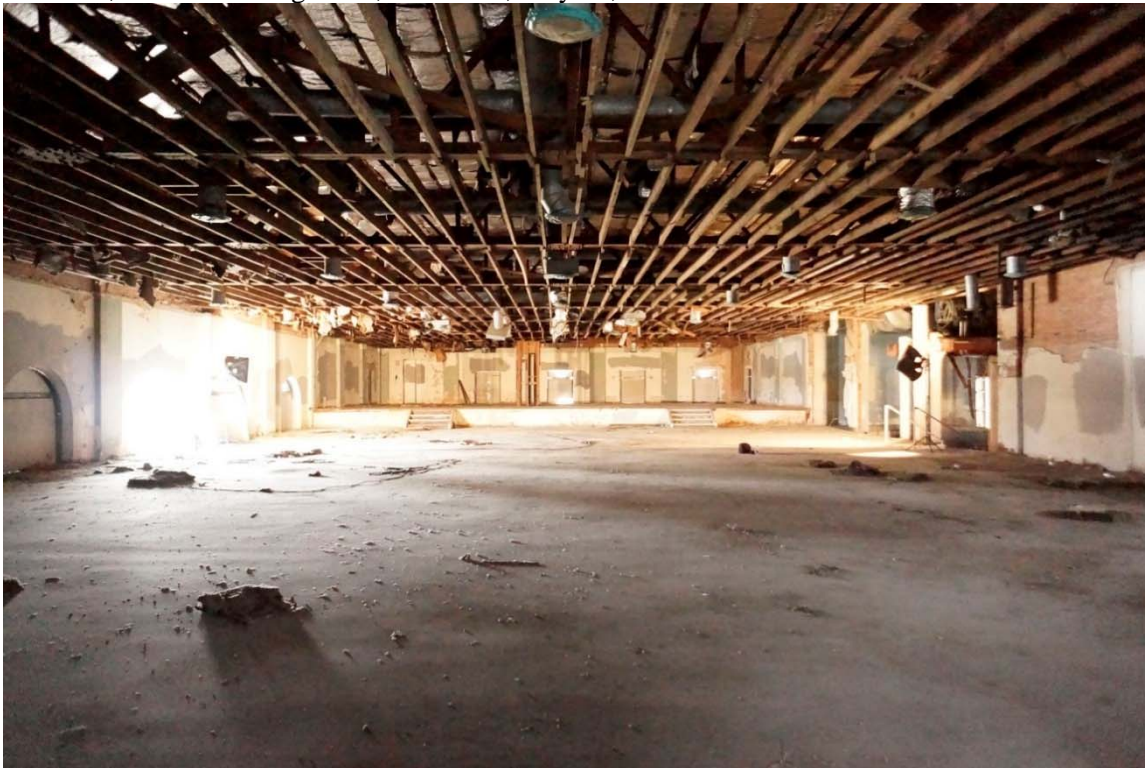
, interior looking southeast, fourth floor, elevator and stairwell, May 14, 2015
